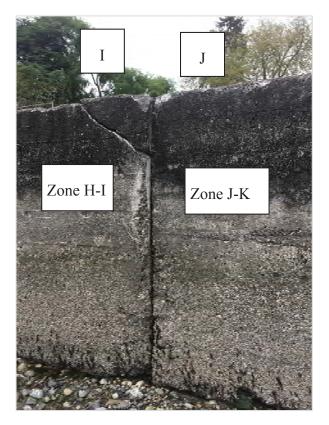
Zones H-I & J-K. Source: Reid Middleton Site Visit 5/31/2017
